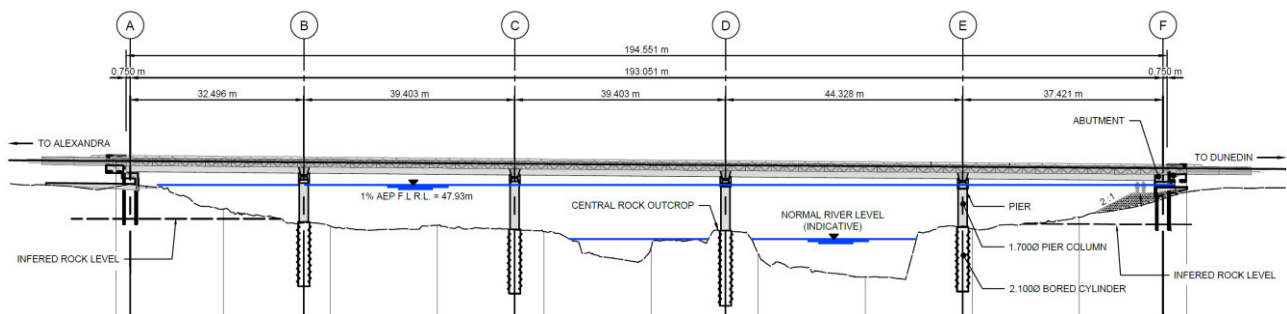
Structural long section of the proposed bridge viewed from downstream
